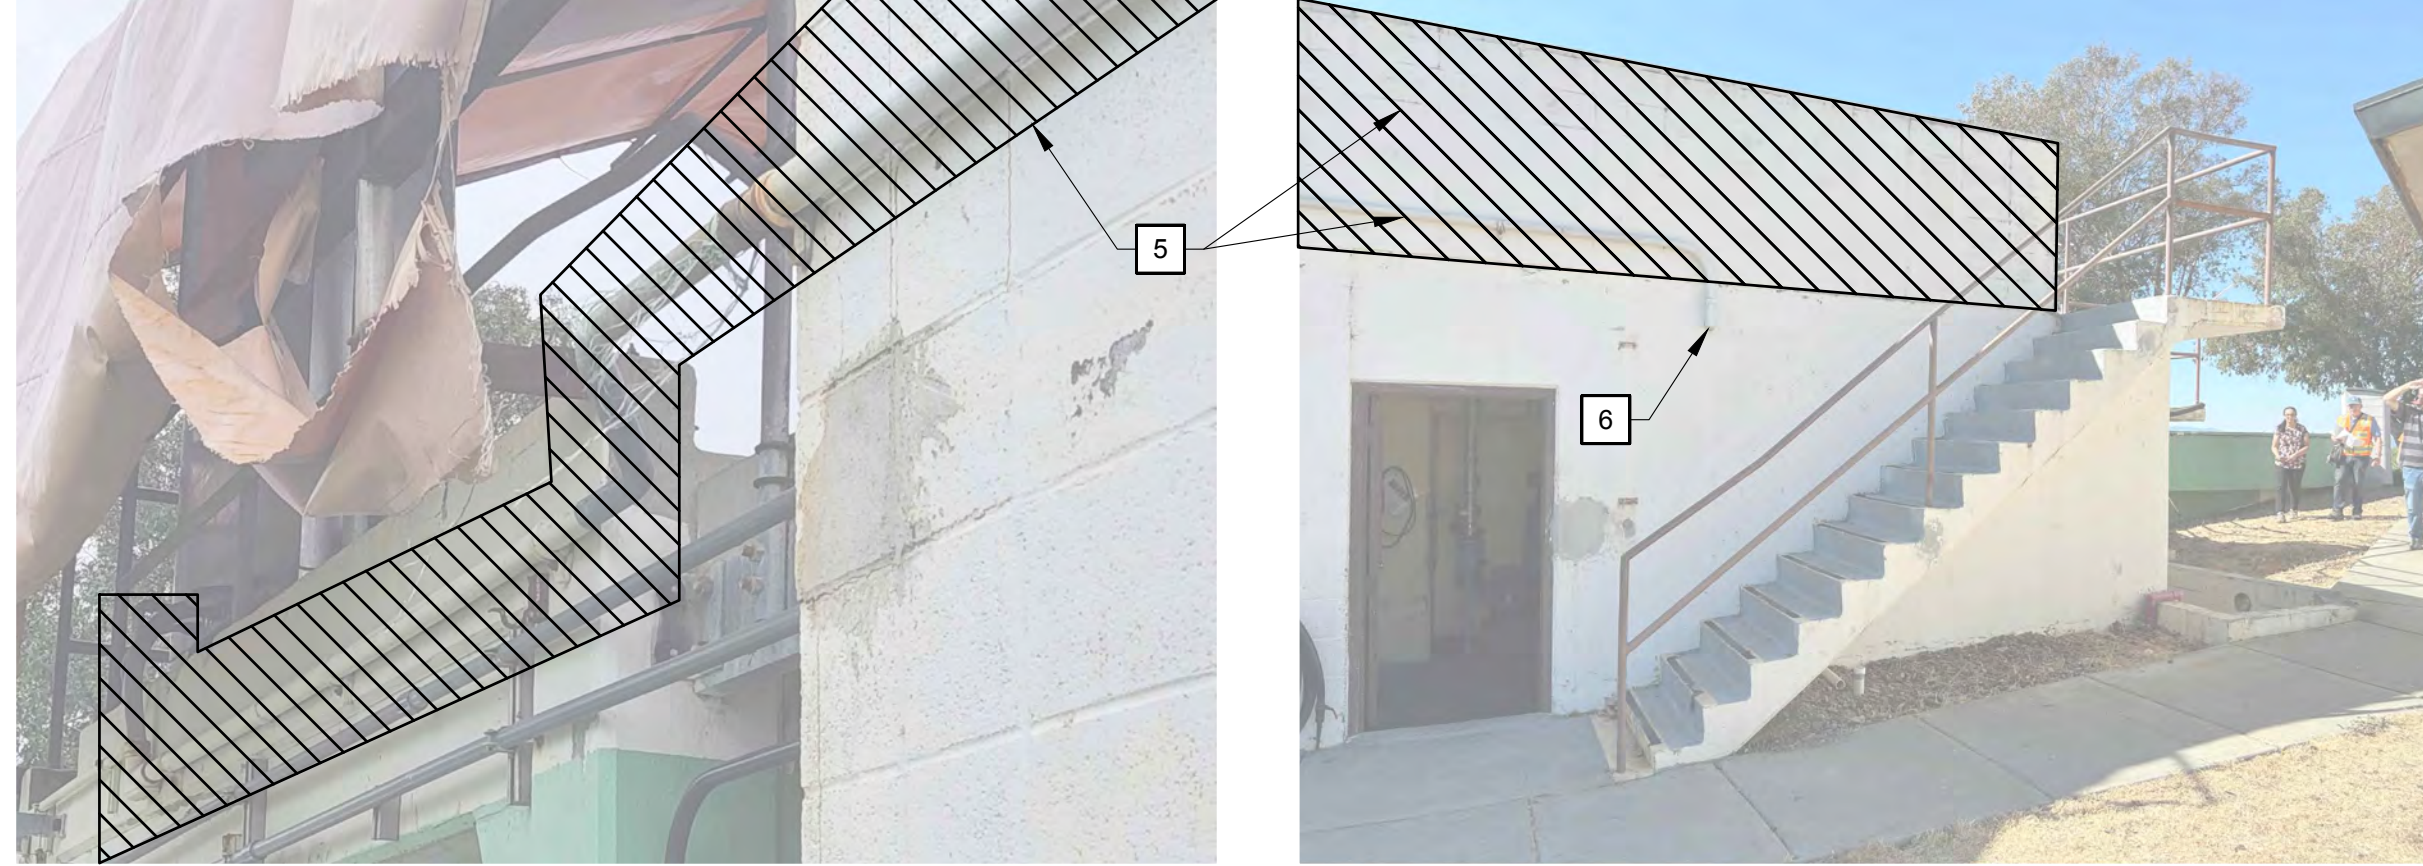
PHOTO - HEADWORKS STRUCTURE DEMO (2)
